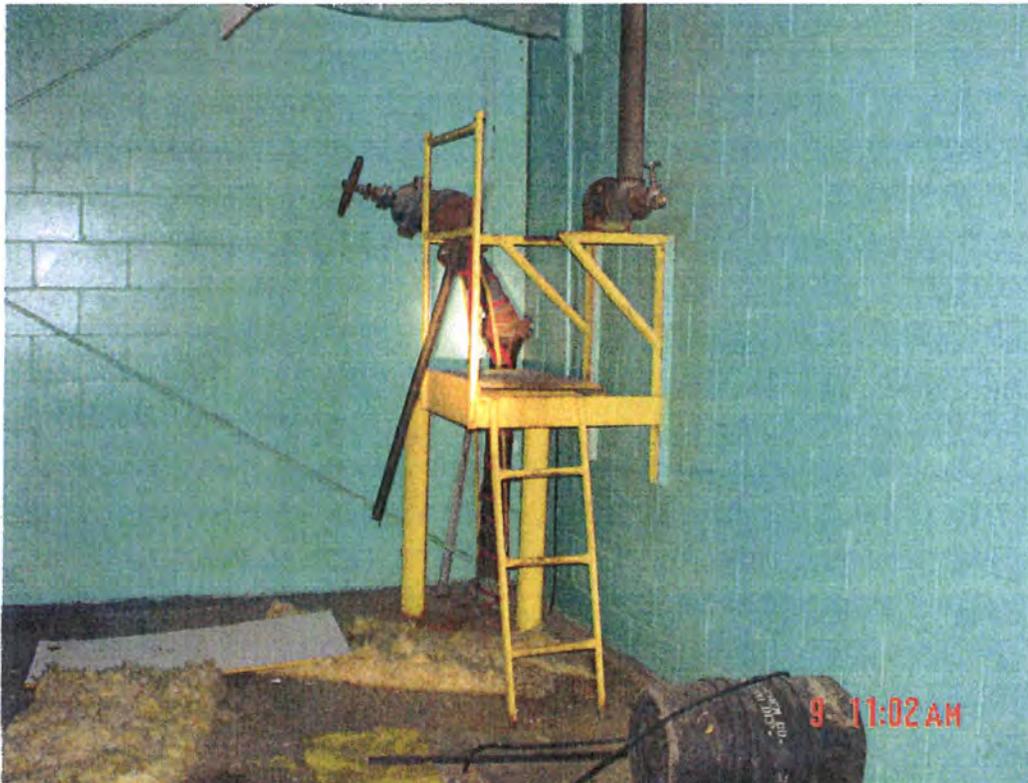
Barrel valves located in Building 12 "The Blue Room".
